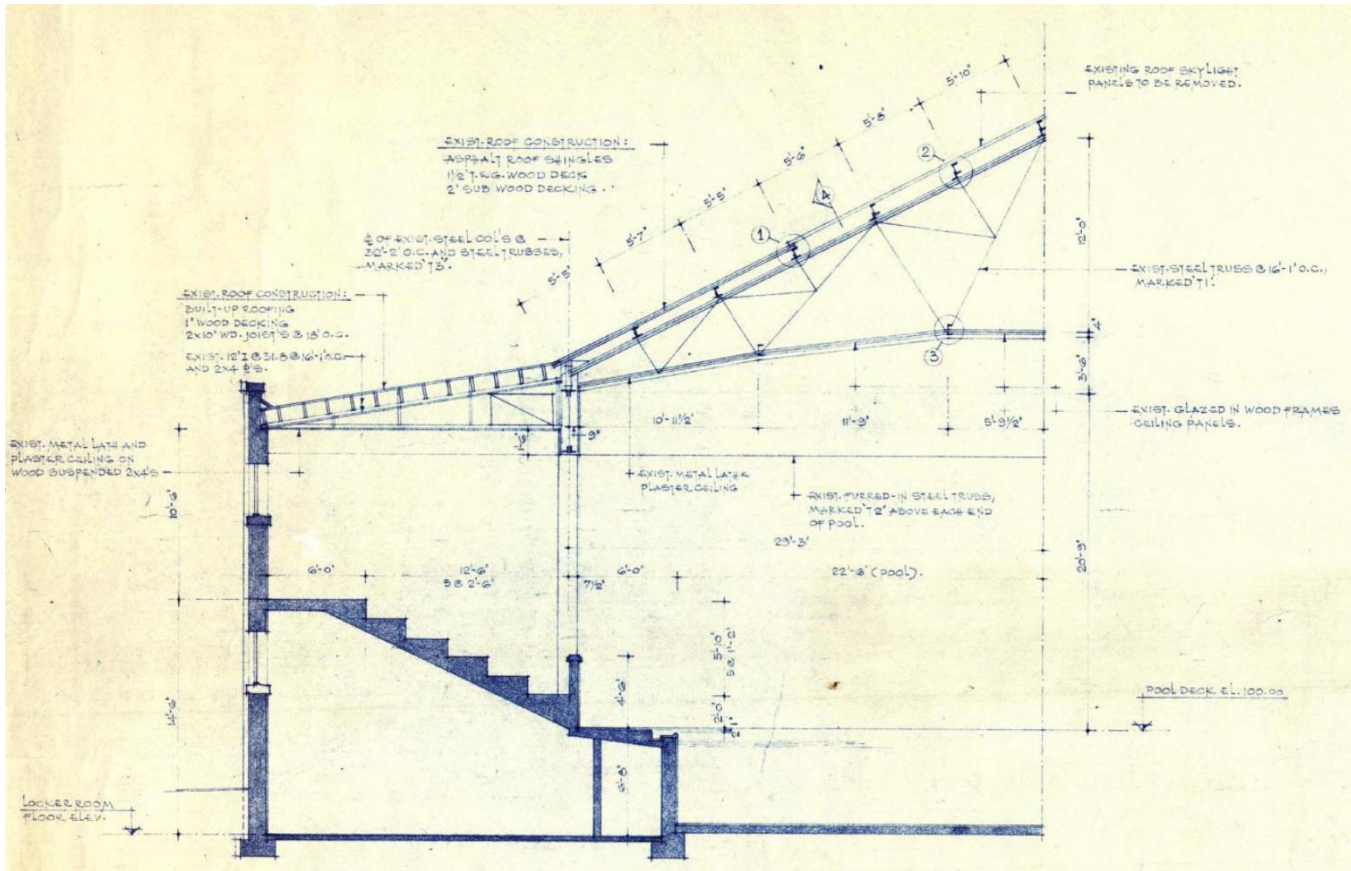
East/west half sectional view through centre of building showing bleachers and skylight roof truss.
